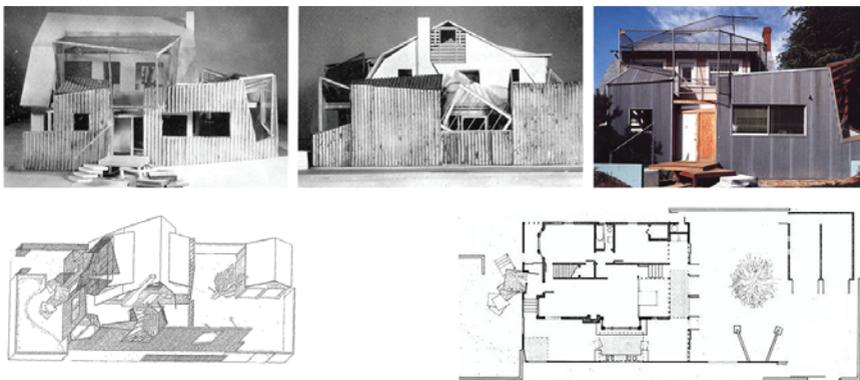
Frank Gehry: (1978) House in Santa Monica, elevations and plan
